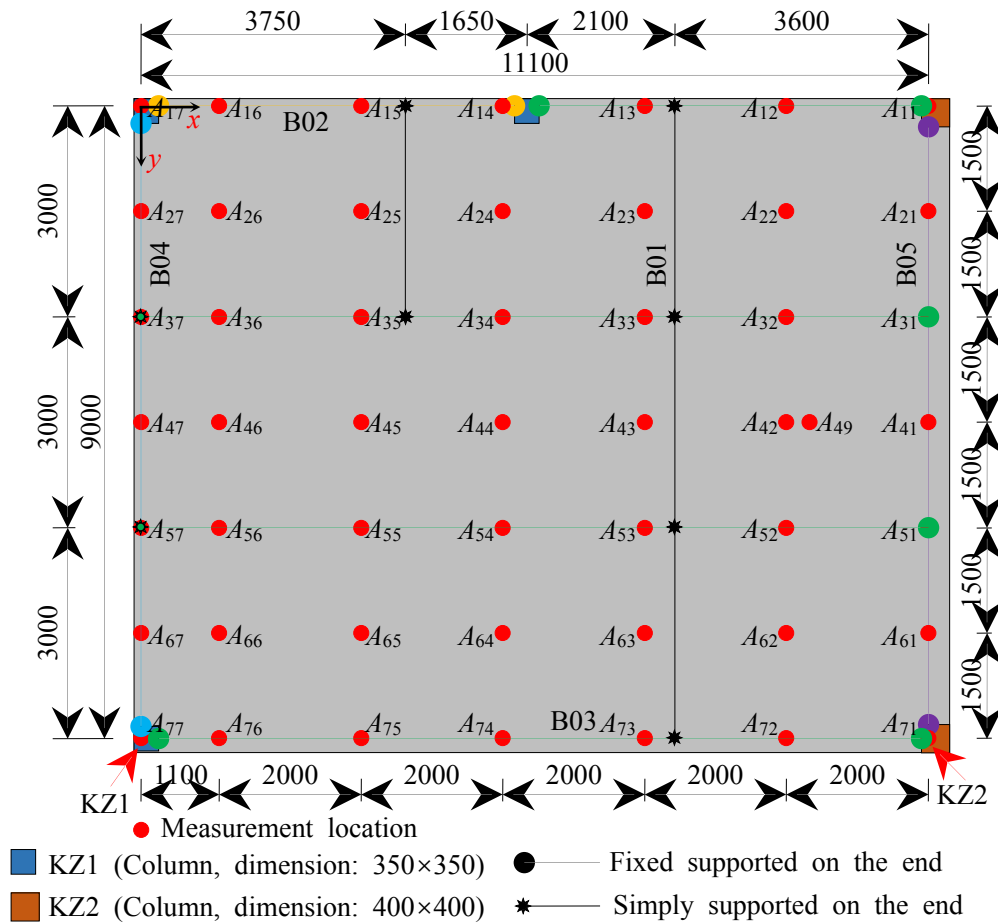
The structural arrangement of composite floor and layout of accelerometers (unit: mm)
